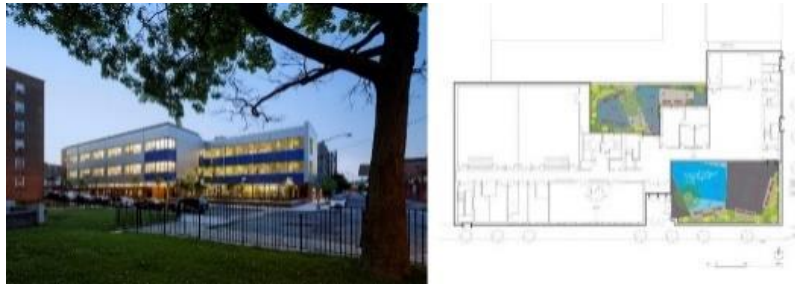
Building 4- PAVE Academy Charter School, Mitchell Giurgola Architecture (URL-5)
